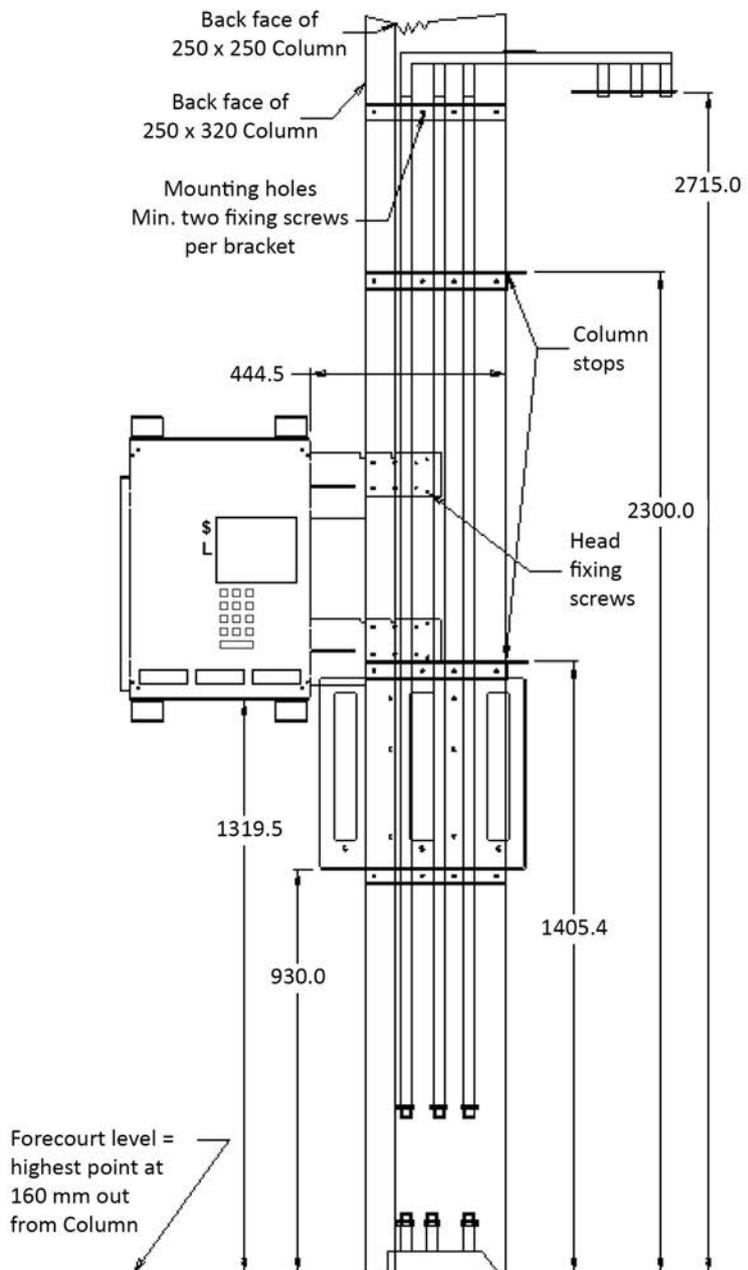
Vertical Delivery Pipes Assembly Mounting Positions
